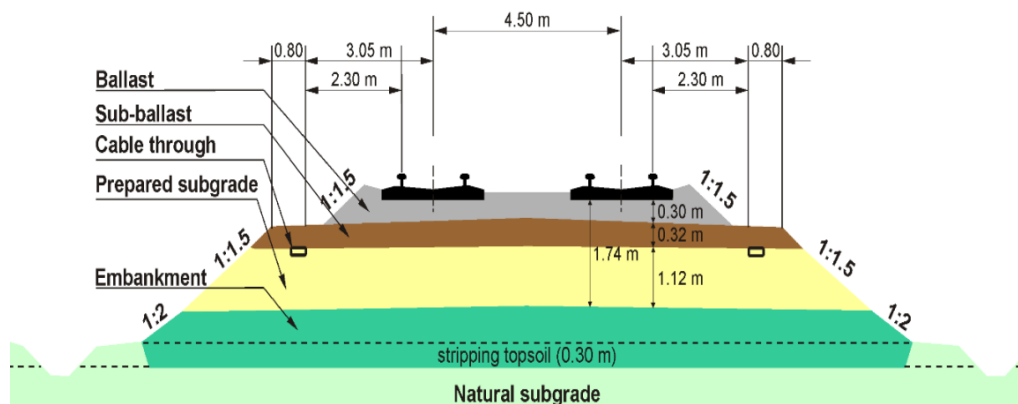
Rail Baltic track construction typical cross-section [17]
